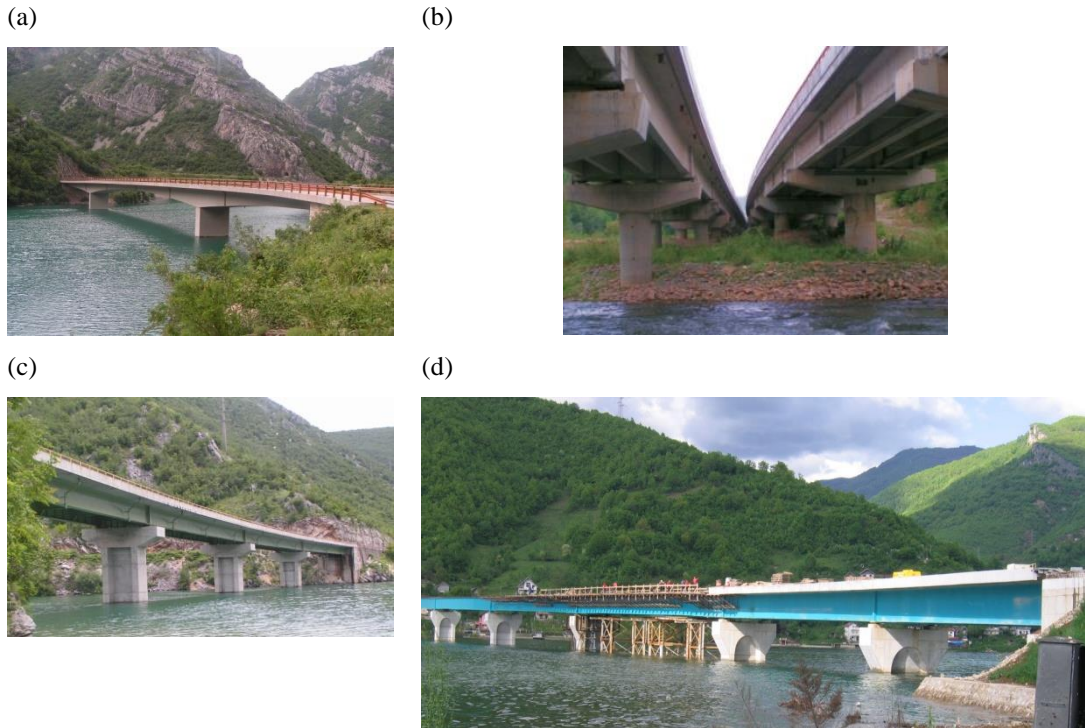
Bridges in Bosnia and Herzegovina: (a) Prestressed concrete bridge “Aleksin han”, (b) Prestressed concrete bridge over river Bosnia, (c) Reinforced concrete bridge “Bijela” Salakovac; (d) Composite bridge over lake Jablanica
